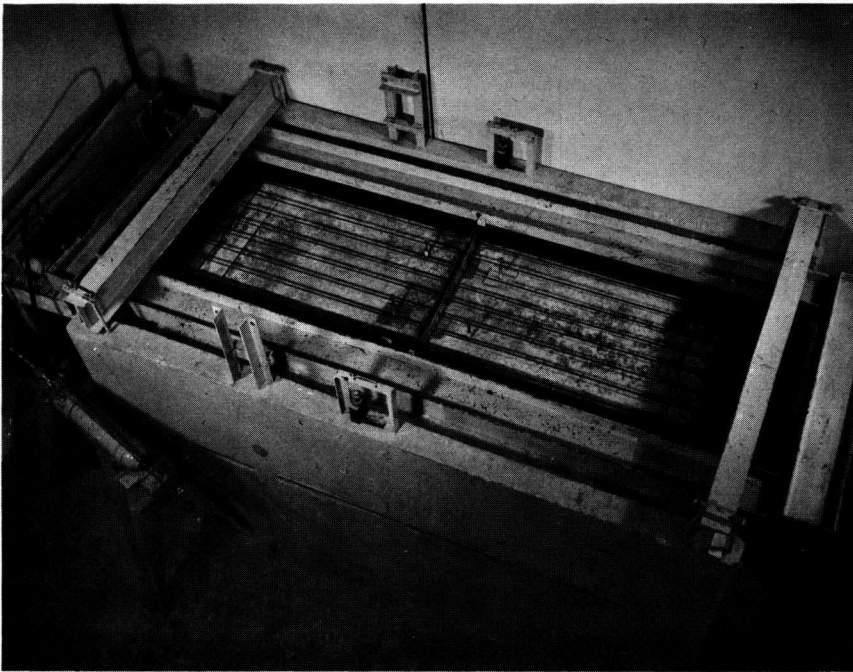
View after placement of subbase material showing prestress frame and wires prior to casting concrete slab. The center-joint dividing strip is in place.
